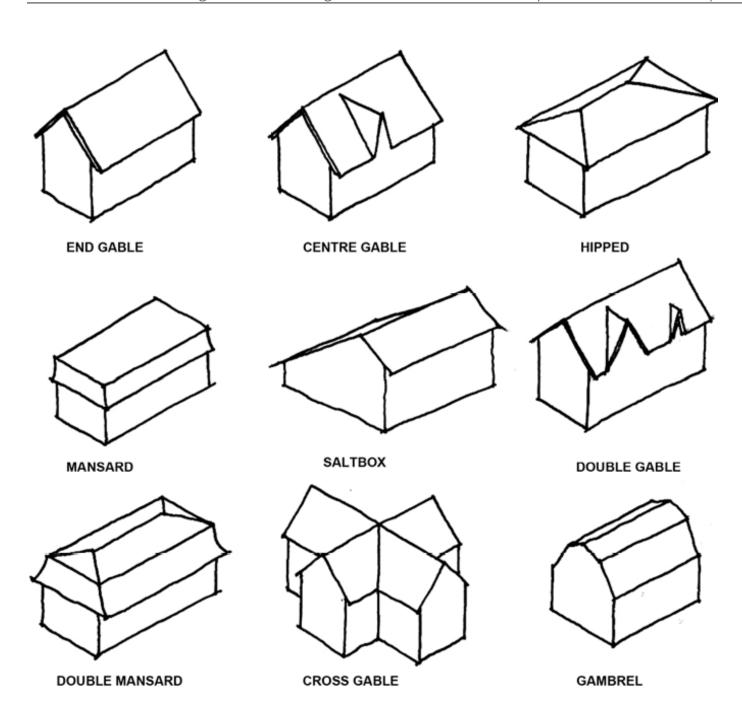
Roof Type Image Credit: Woodbridge Heritage Conservation District Plan and Guidelines (2009). Goldsmith Borgal and Company Architects (GBCA)
